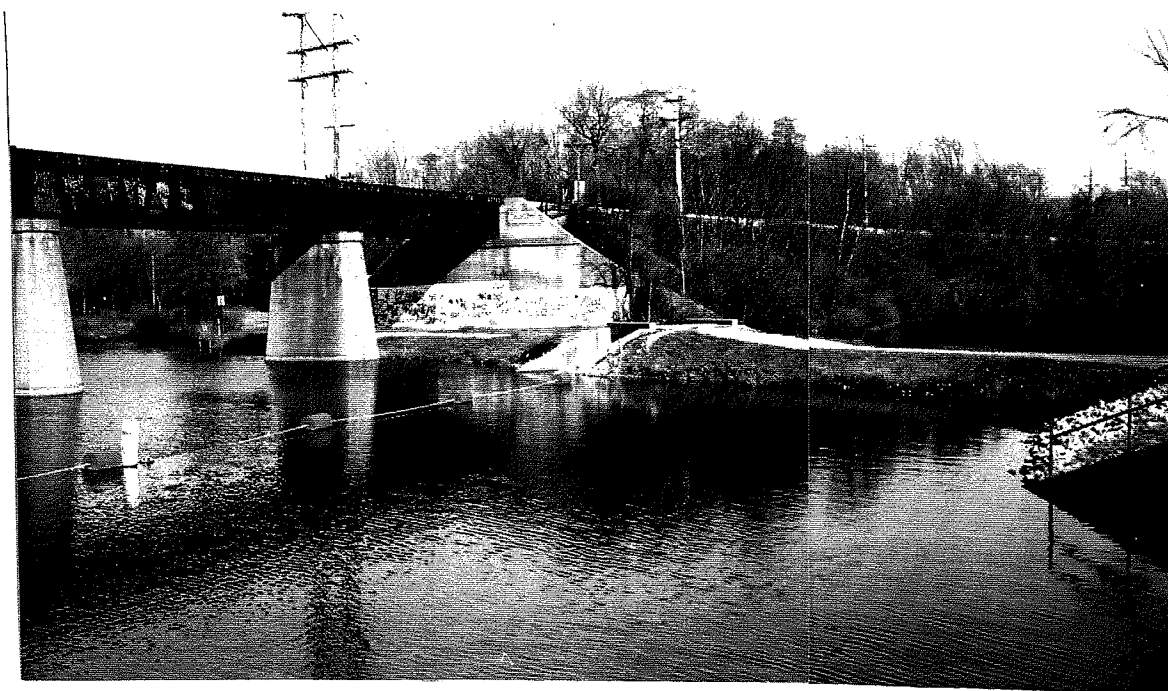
Upstream face of left earth embankment protected by rip-rap. Earth dike that branches off old headrace dike. Nov. '92
